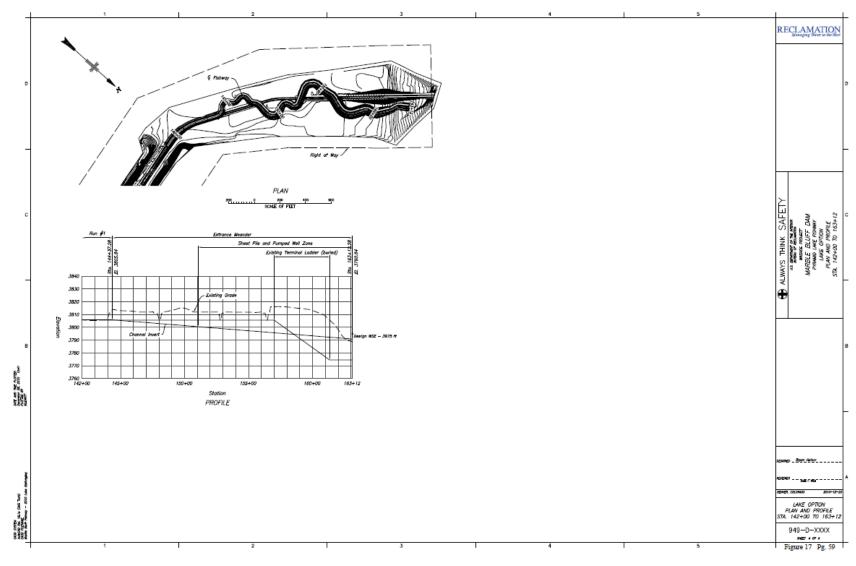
Lake fishway – plan and profile – station 142+00 to 163+12
